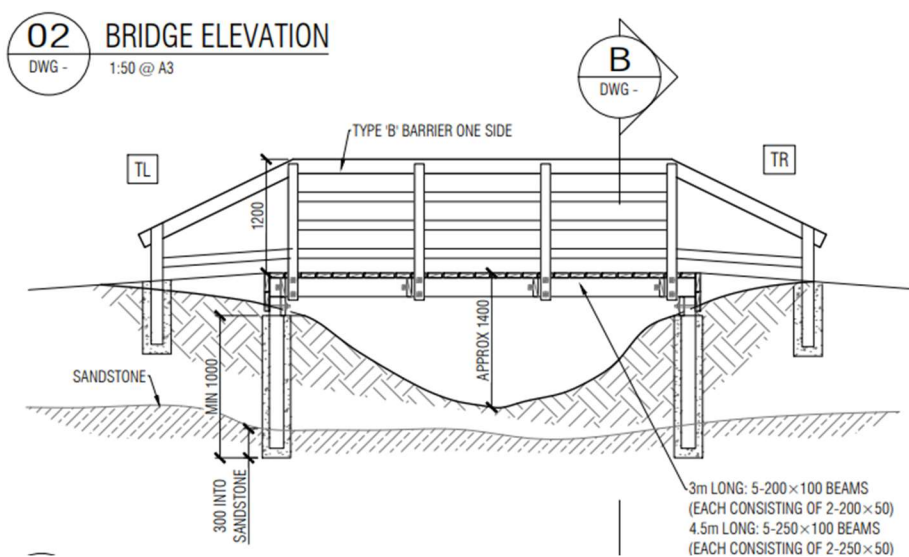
Bridge design for bridge 1 and 2 from Frame Group drawing 24/009-05
